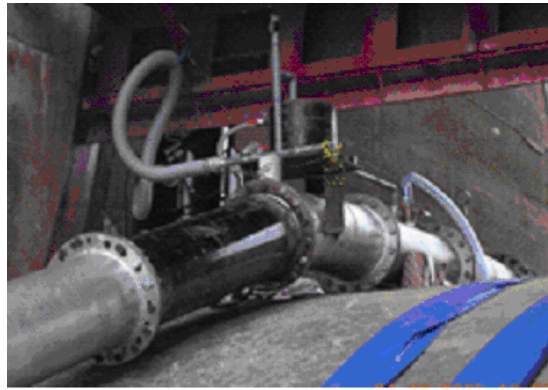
Discharge Pipe over Crest at Spillway
